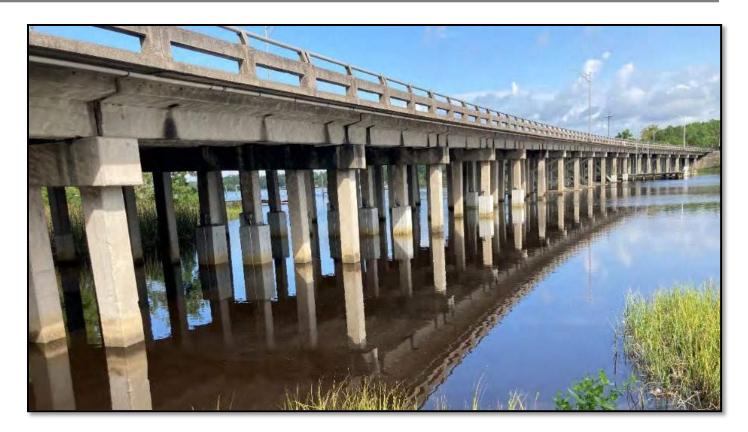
EXISTING BRIDGE, DOWNSTREAM SIDE FACING NORTH 2
